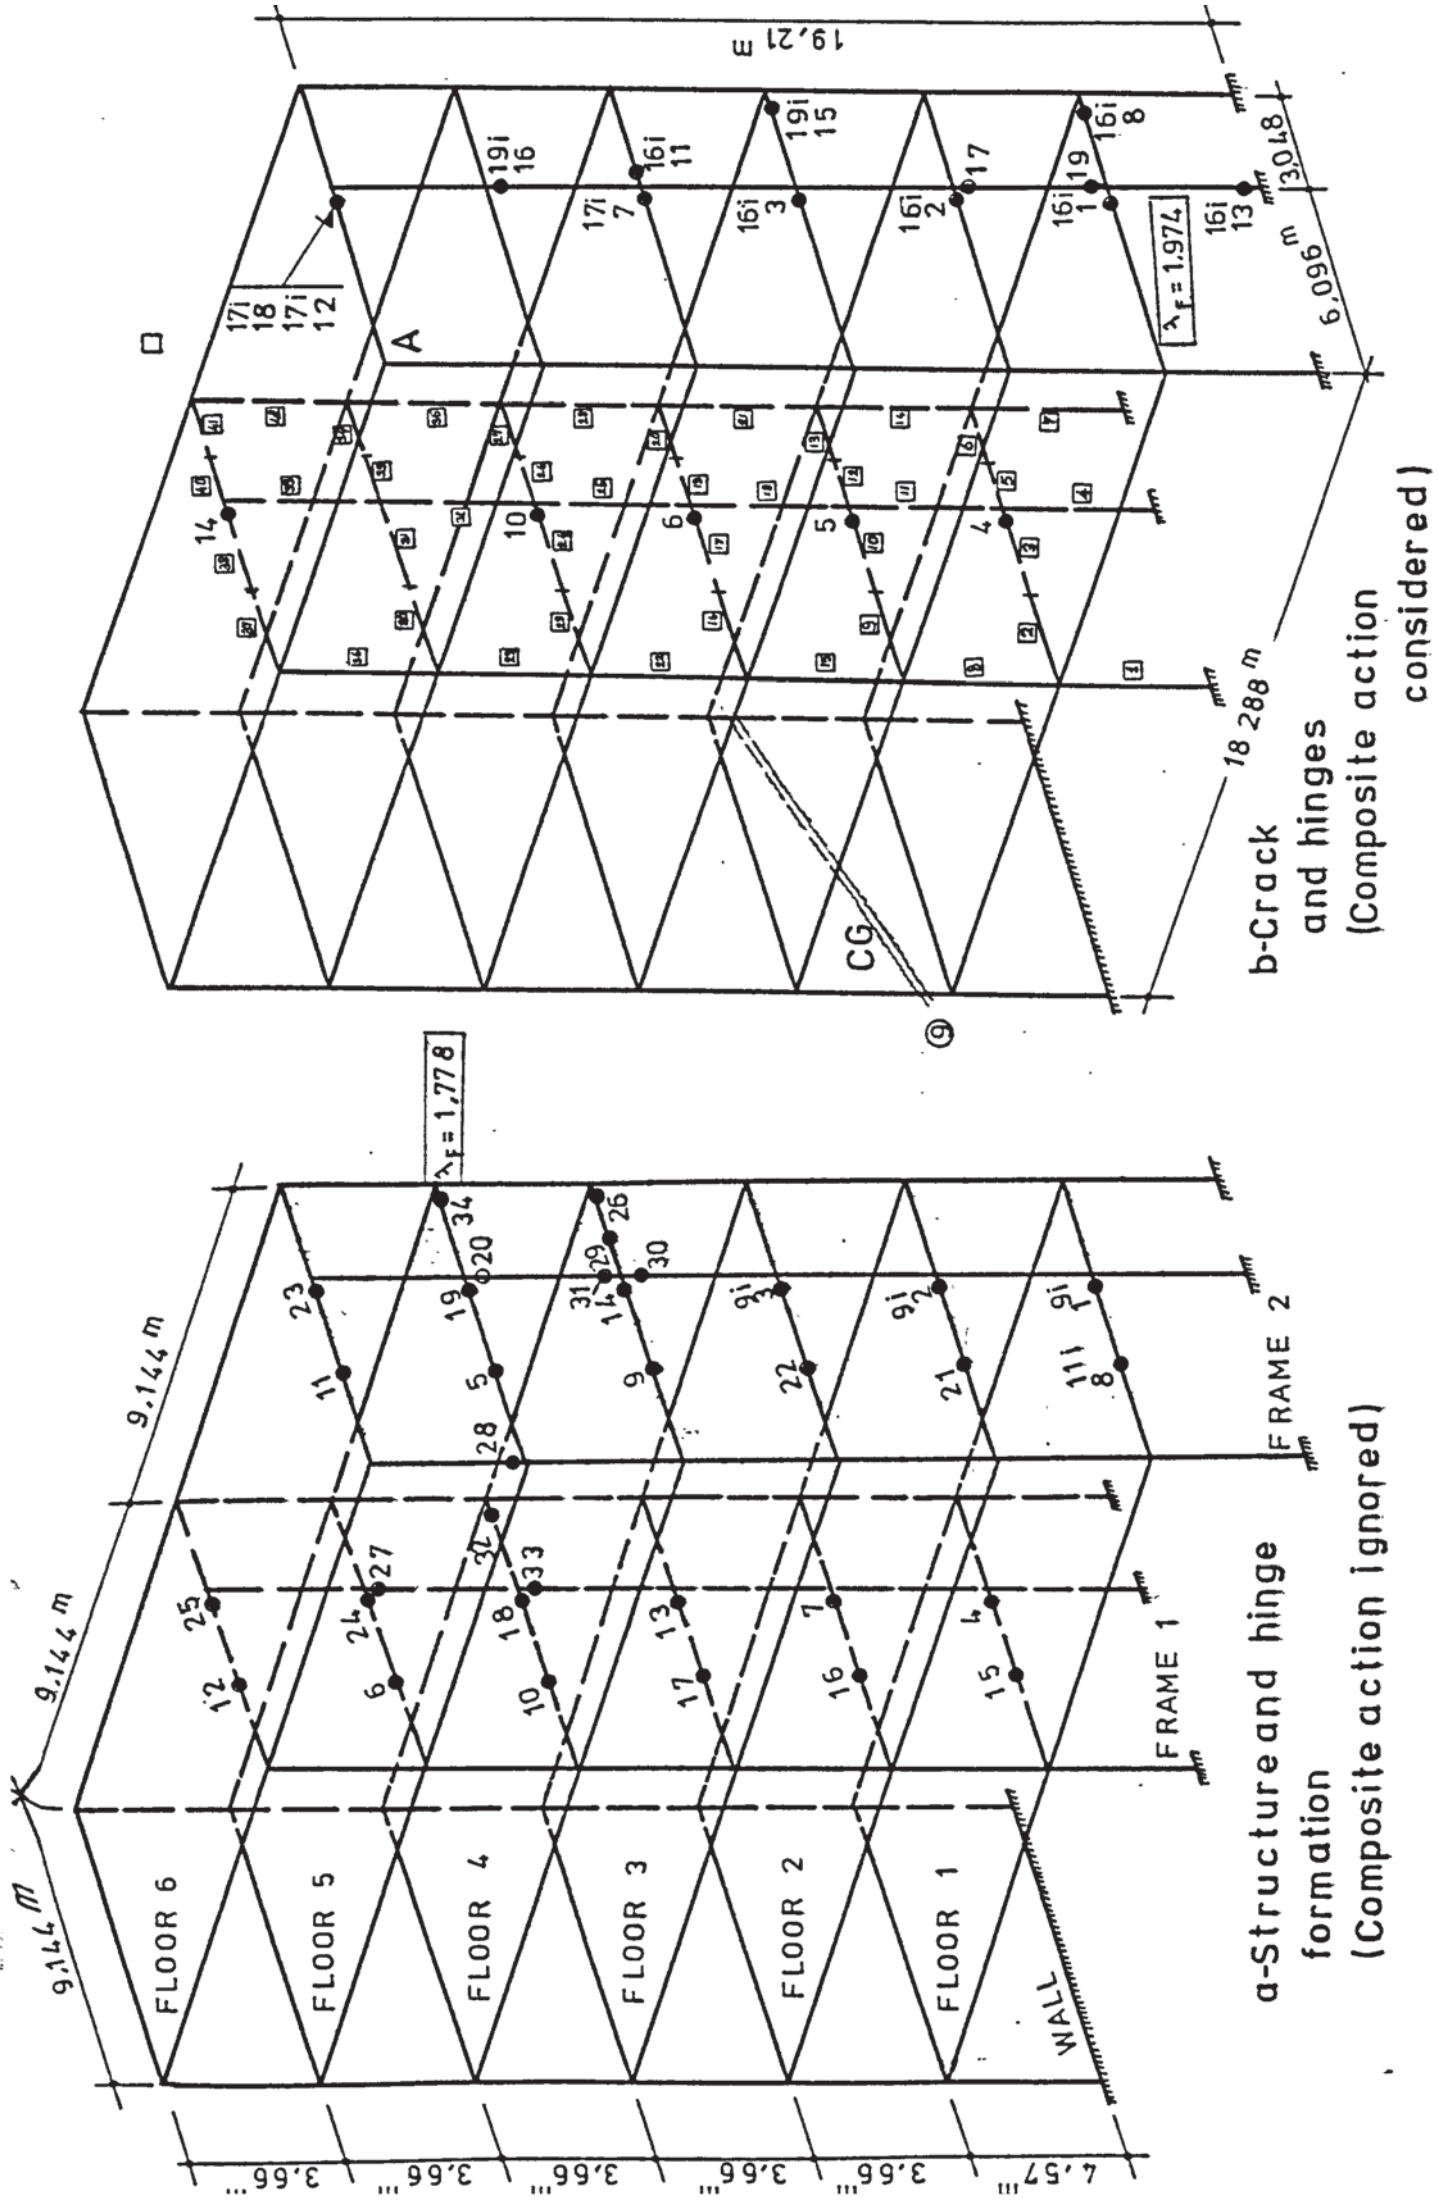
SIX STOREY STRUCTURE WITH ONE SHEAR WALL
